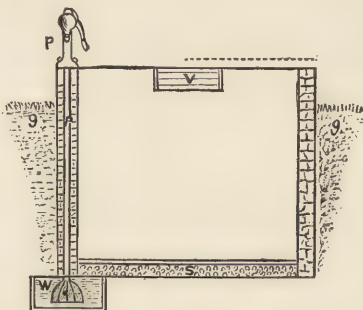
Vertical Section of Ice apartment or Basement—P, Blunt's Pump; P, Pump Pipe, 3 inches diameter; V, Ventilator on each of four sides; S, small stones for drainage; g g, Surface of Ground; W, Well under wall.
